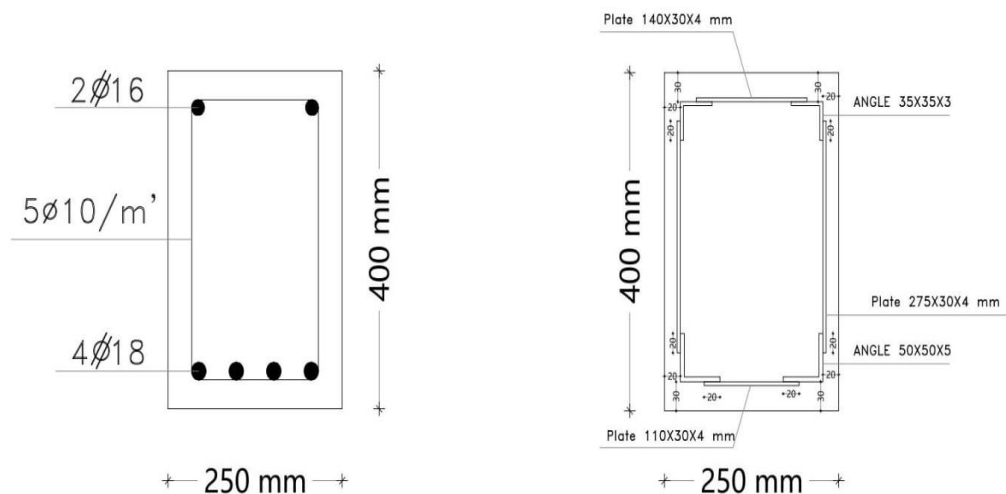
The cross sections of RB and trussed composite beams (all the dimensions in mm)
